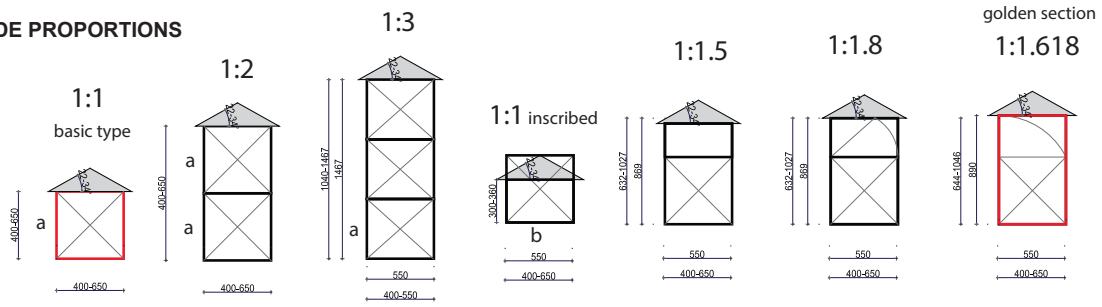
c), Geometry and proportion in Gjirokastra traditional houses according to the buildings type. Plan and main facade analyses. Part C (source: author's)
